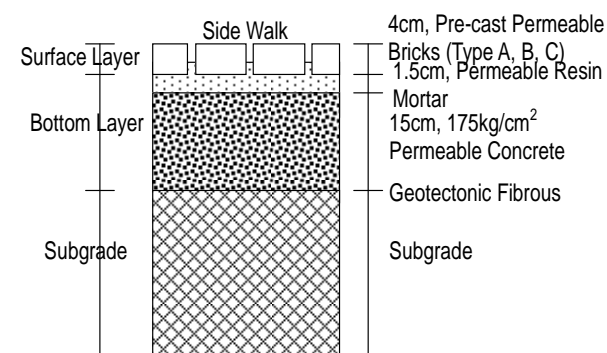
Section of Permeable Pavement Type A, B, and C.
